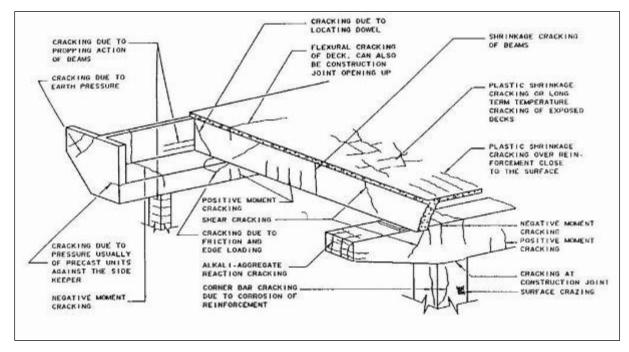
(a) Types and location of cracks in concrete structures
